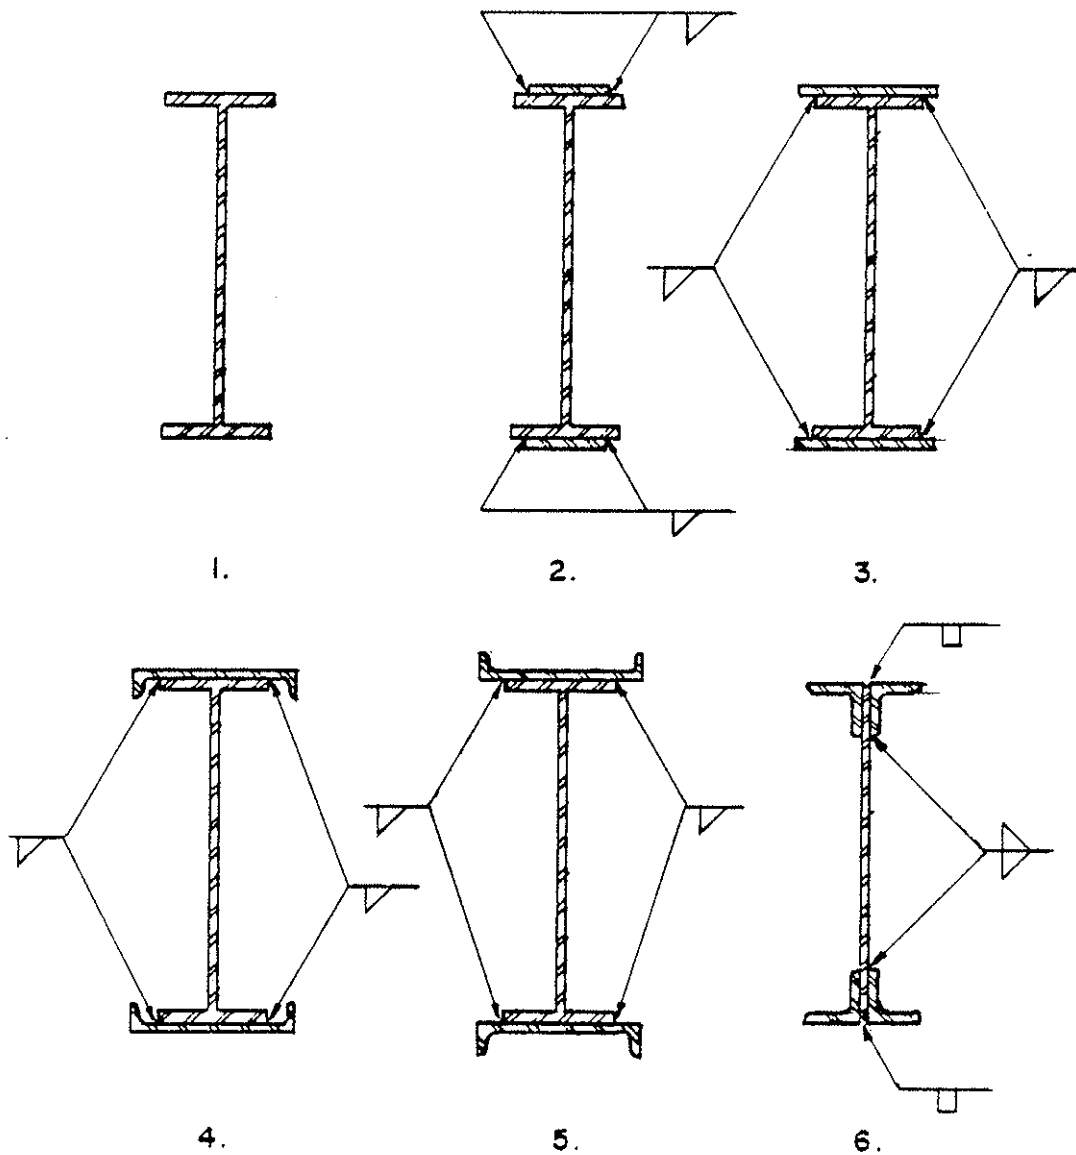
Examples of Typical Built-up Rolled Section Tension Members
